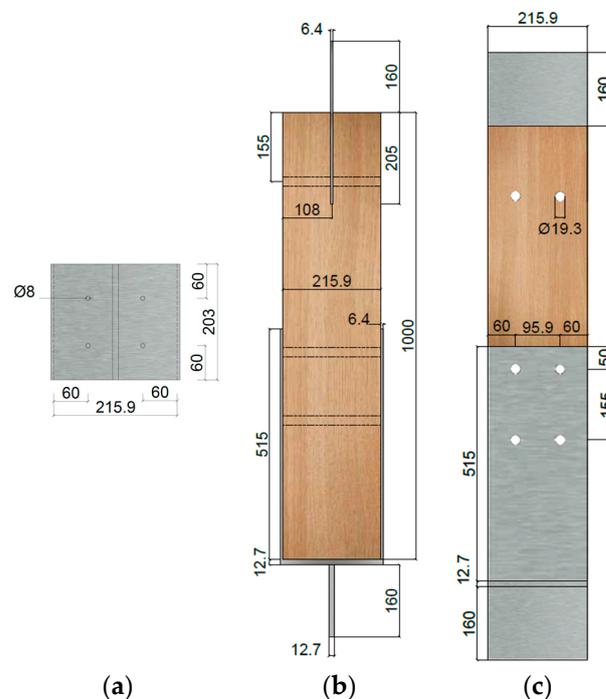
Geometrical description of the slotted-in aluminum timber connection: (a) bottom view, (b) front view and (c) side view.
